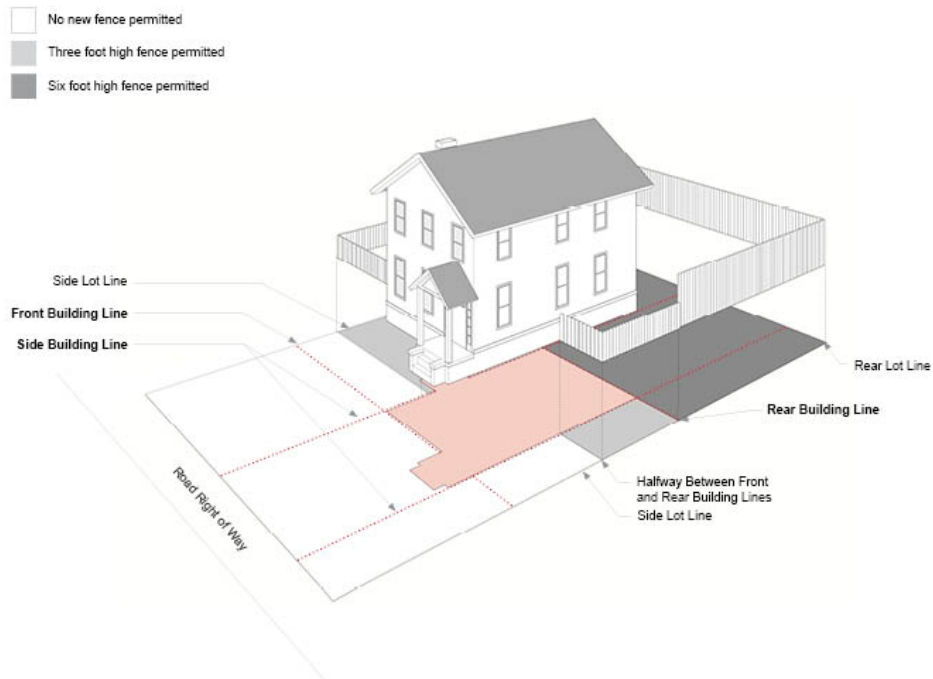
a: House on Interior Lot- Fence Behind Half-Way Point of Front and Rear Building Lines Option B
